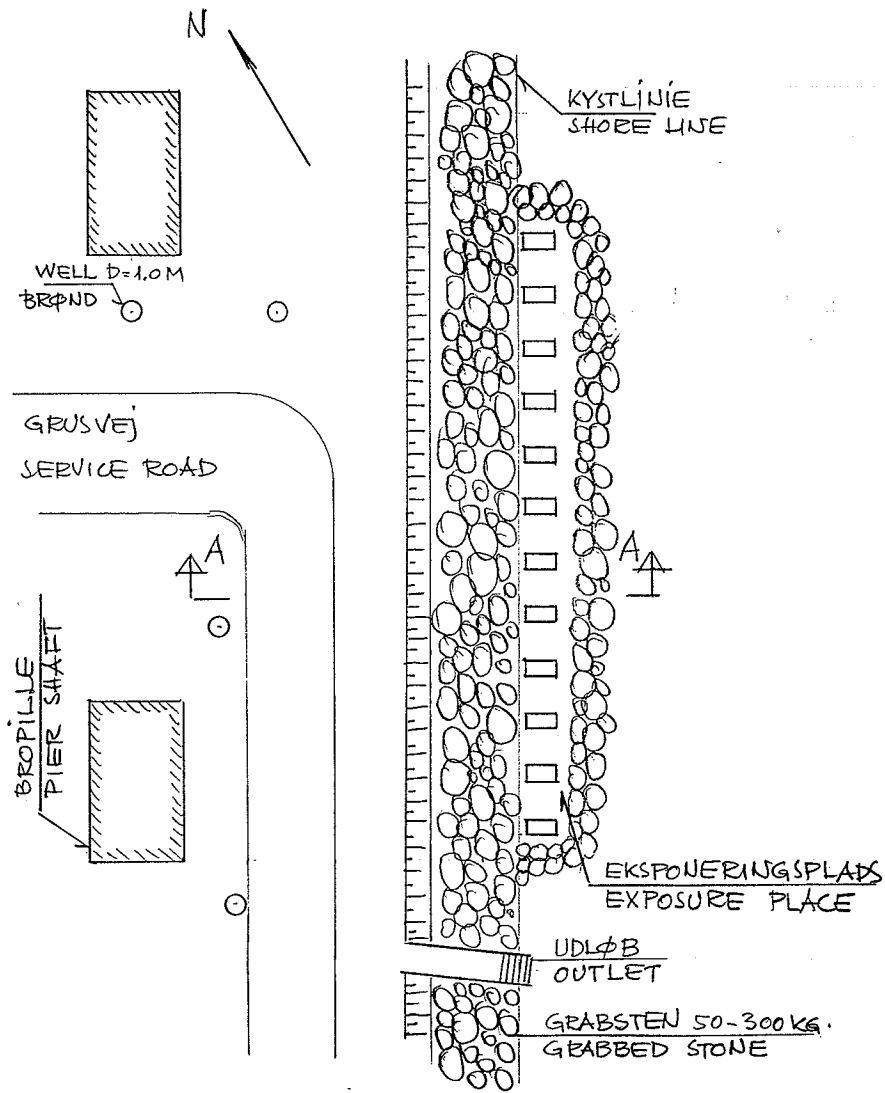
Exposure site, the New Little Belt Bridge, plan 1:300.
